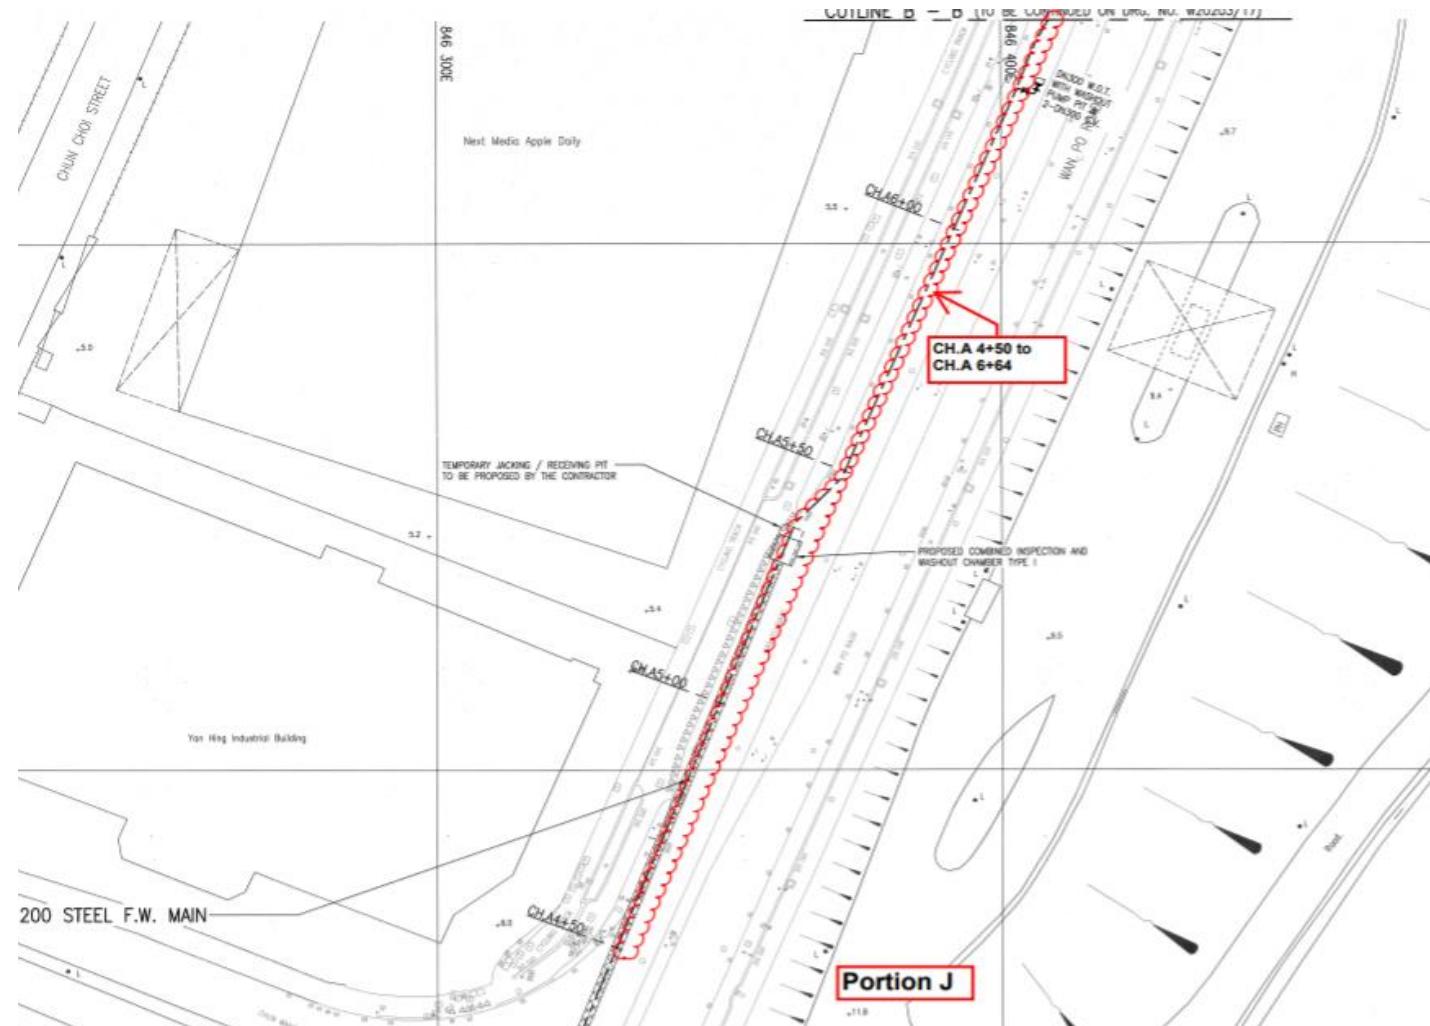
Location Plan for Portion J - CH.A 4+50 to CH.A 6+64
